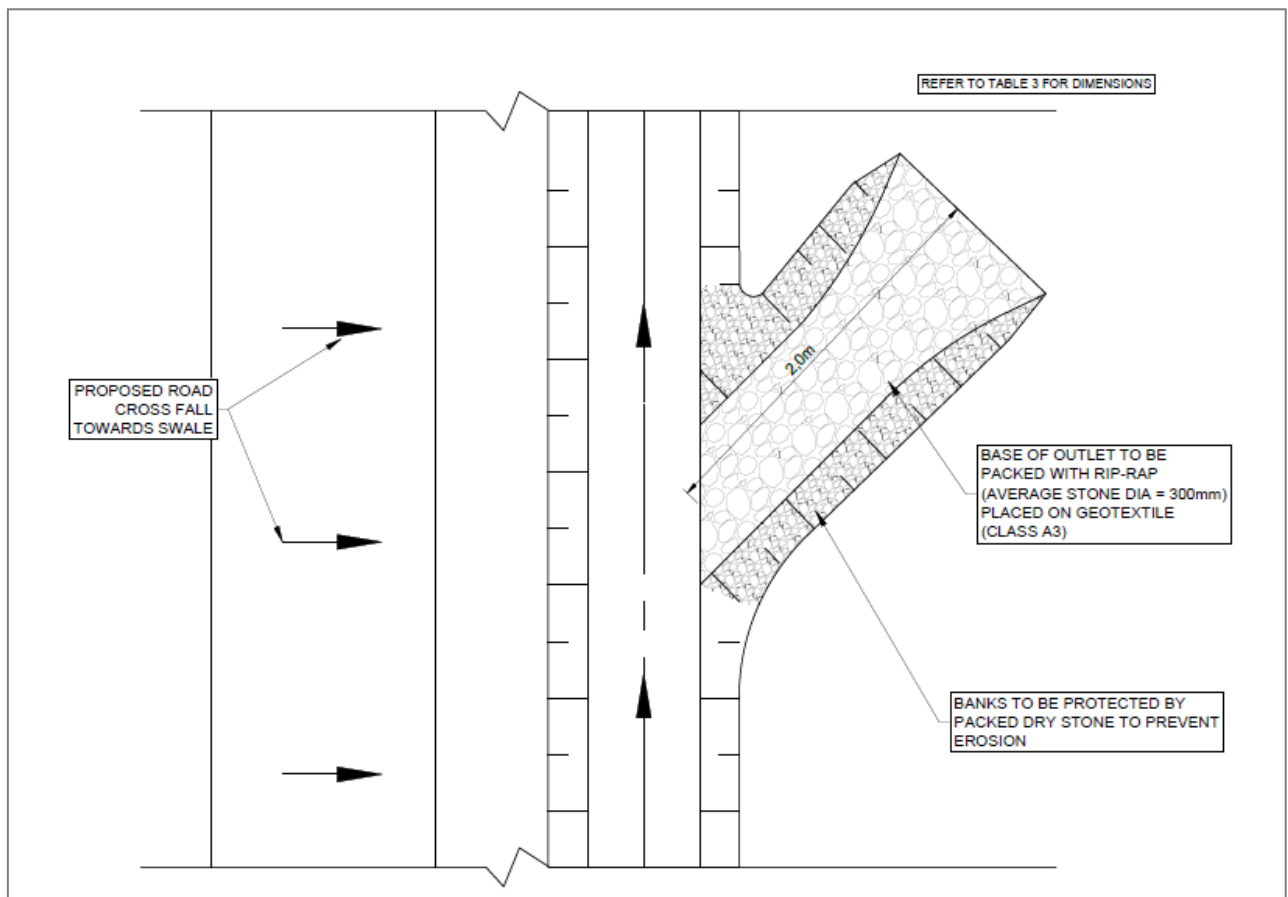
Proposed Swale with outlet towards stream at 20-25m intervals
